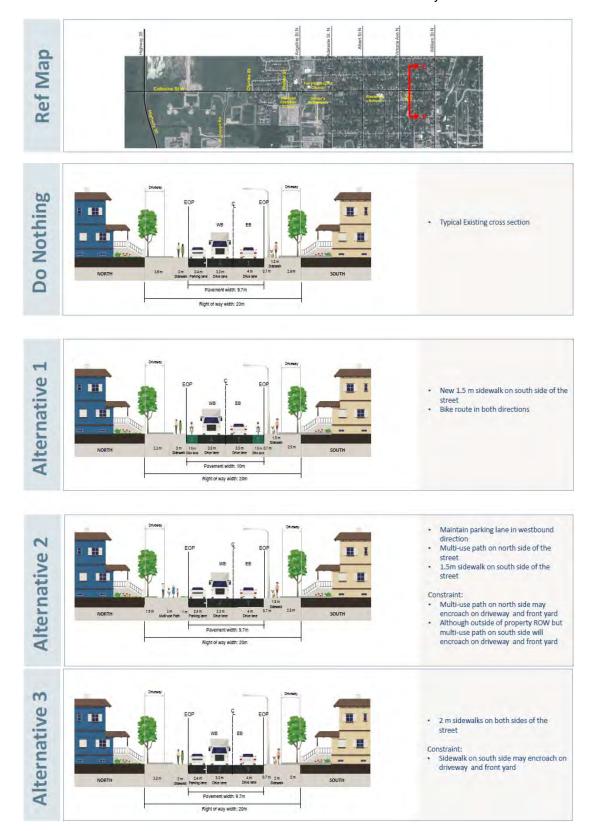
Segment E2: Colborne Street - West of Cambridge Street
